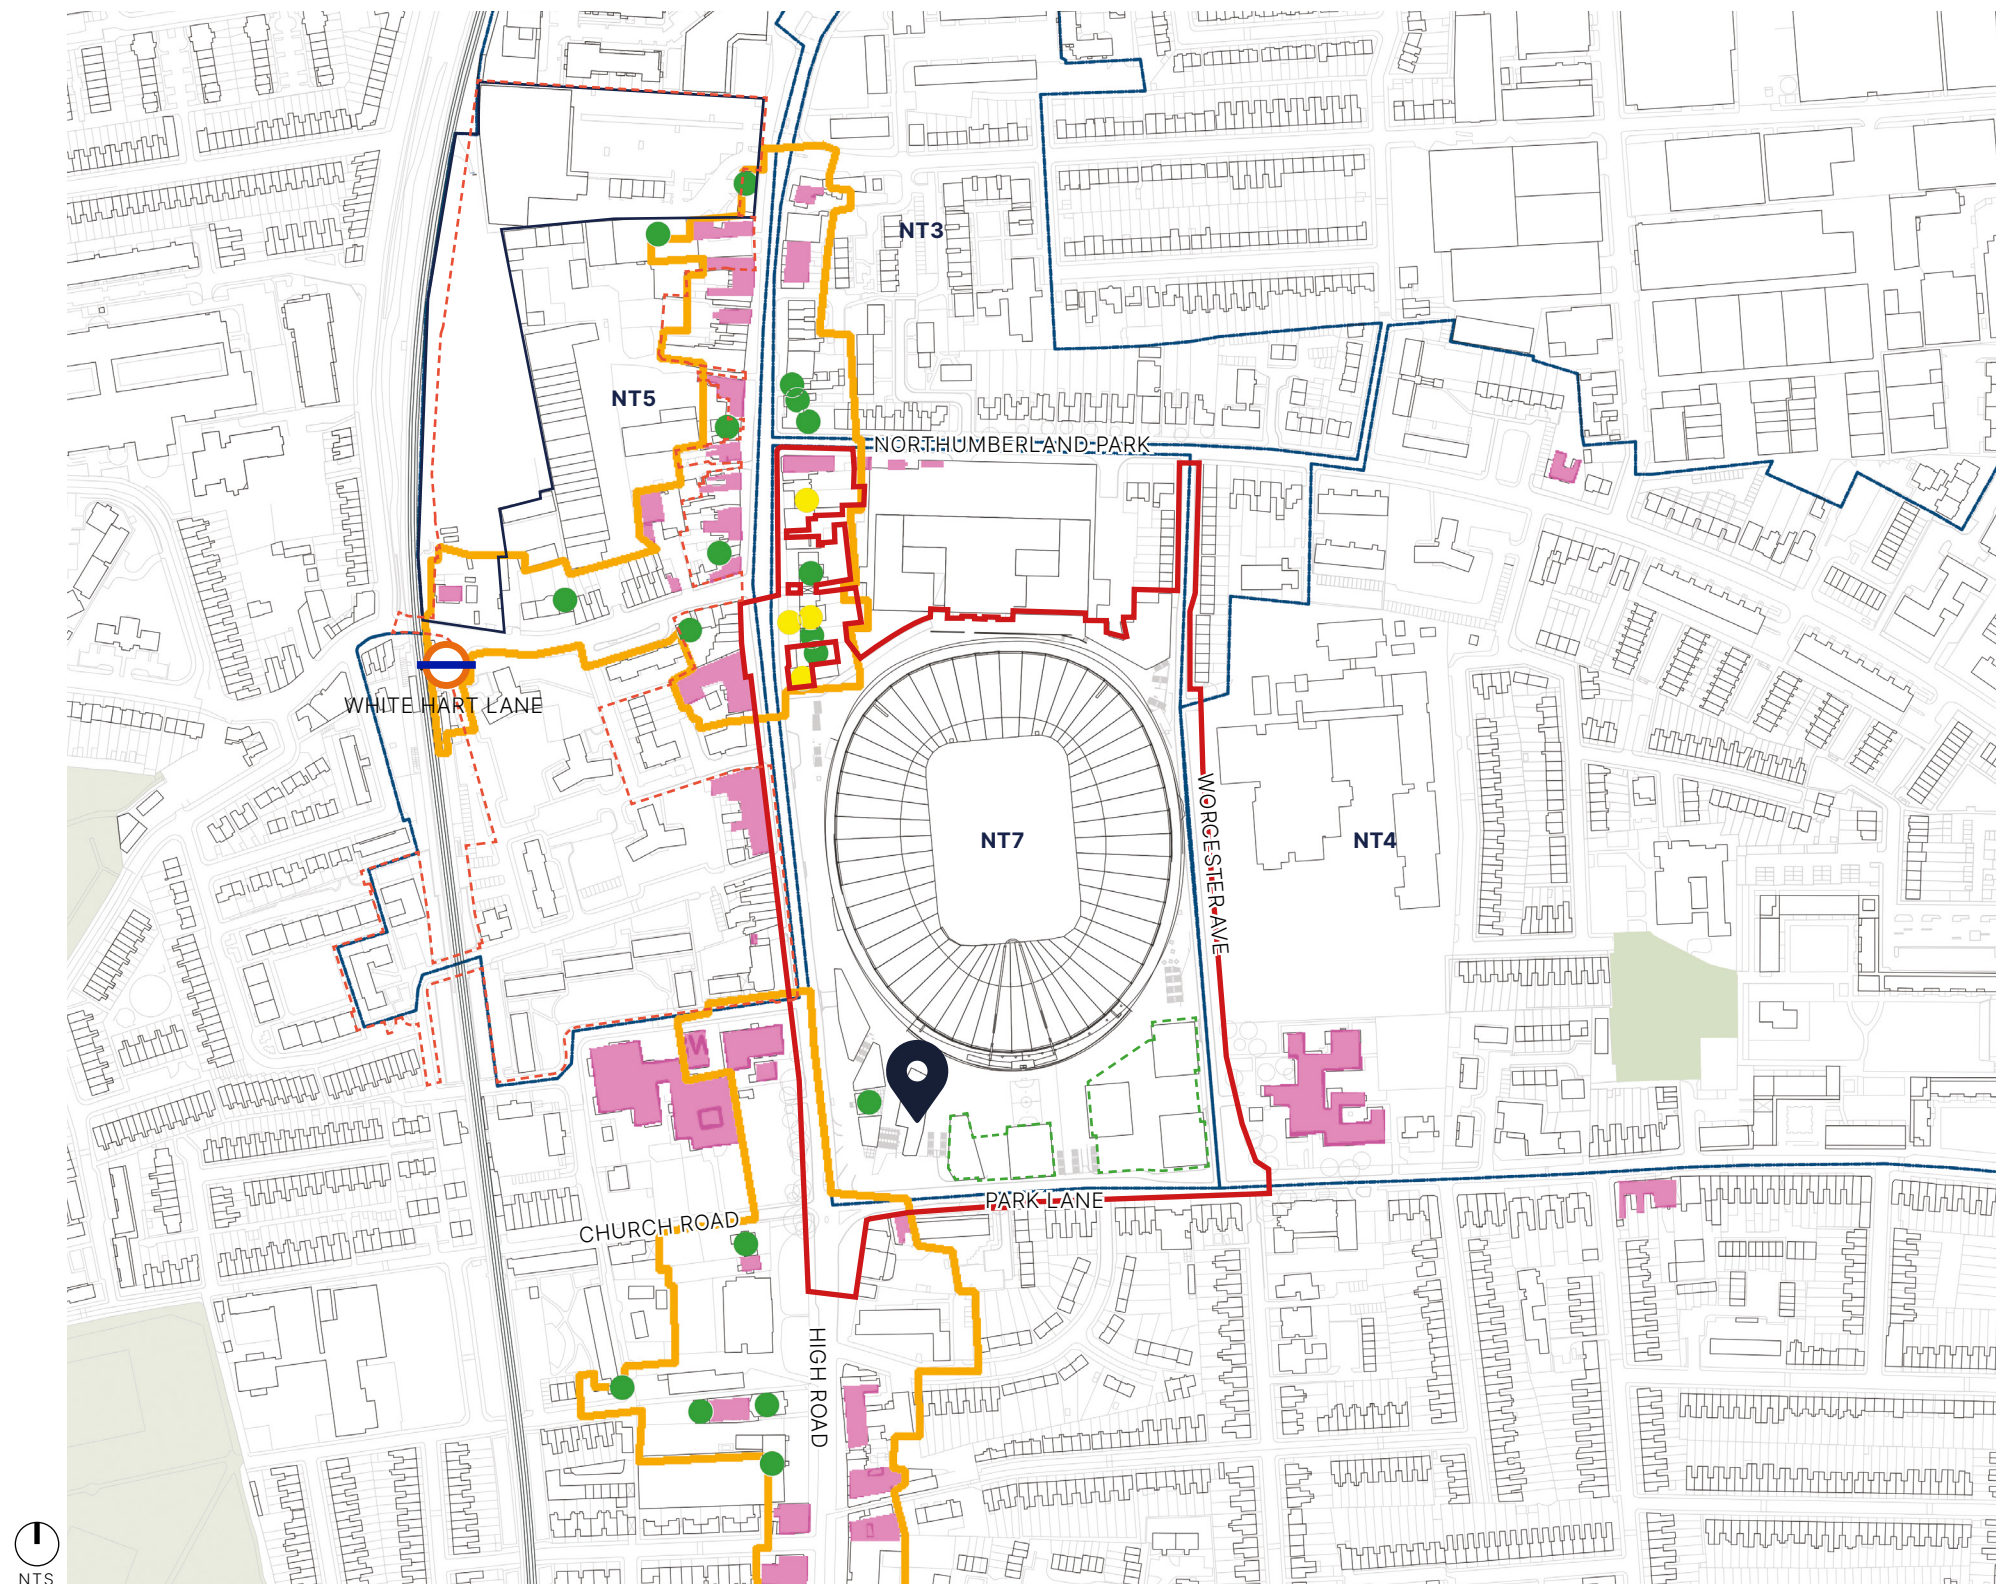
Existing Location Plan (with Approved NDP Outline Schemes)
